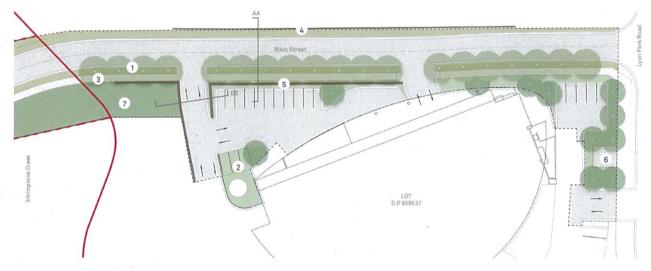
Connection to Lyonpark Road and the proposed treatment to the LGS car park Source: Hassell
